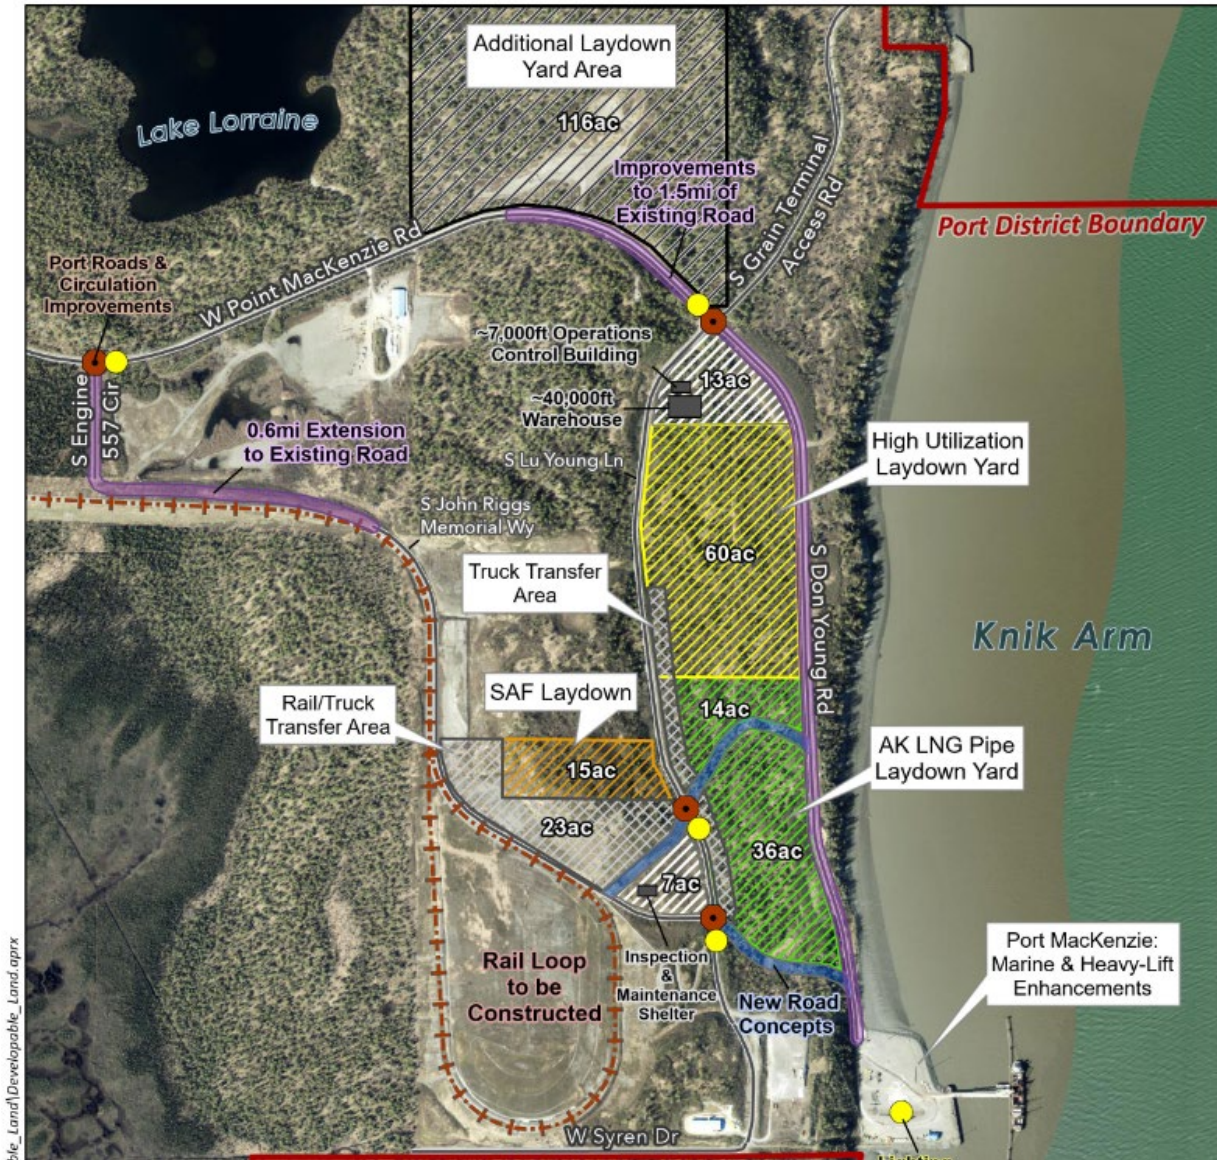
Alaska DOT PIDP Master Layout Plan (excerpt).
